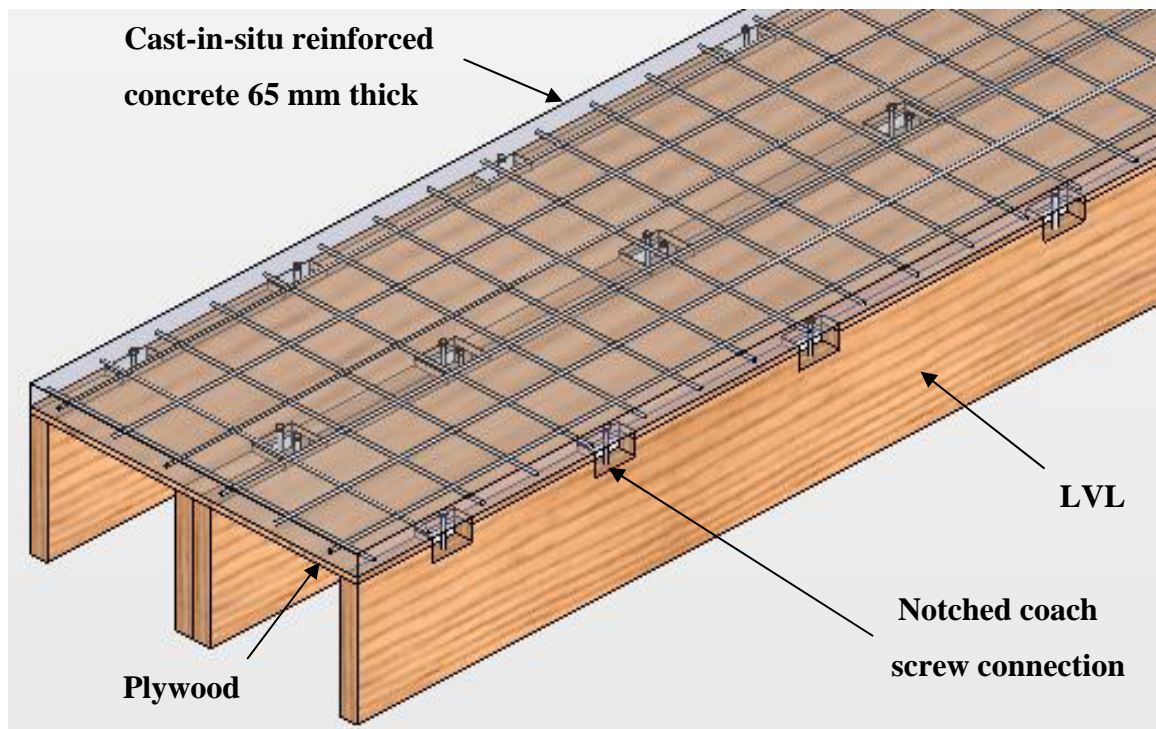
“M” section semi-prefabricated LVL-concrete composite floor system
